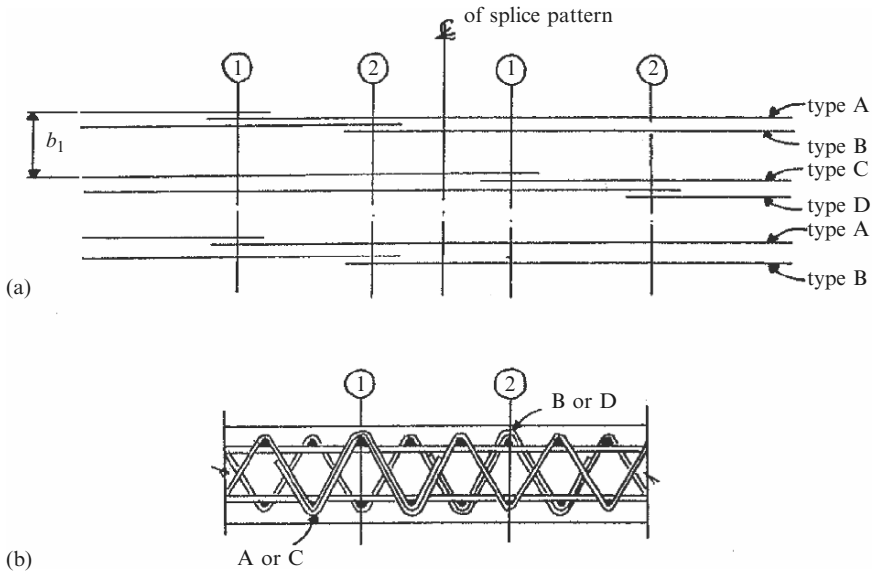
Typical details for splicing of lacing bars: (a) splice pattern; (b) lacing splice
